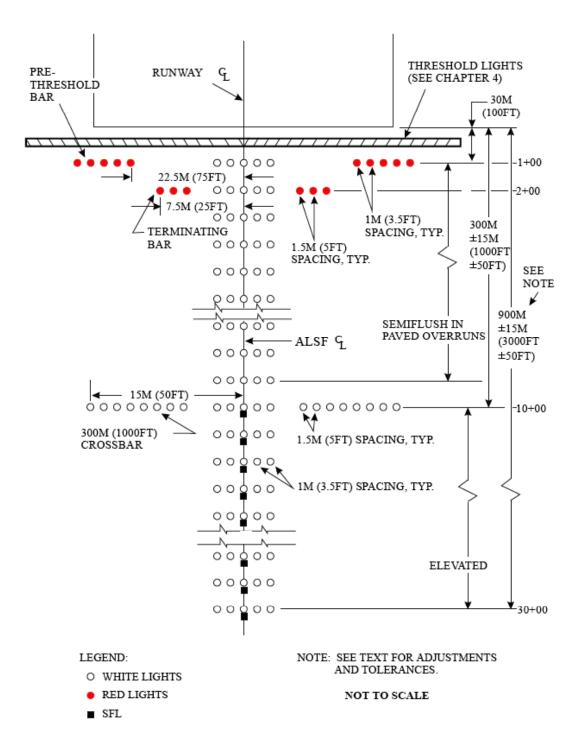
Typical Installation of an ALSF-1 (Source: Department of Defense, Unified Facilities Criteria: Visual Air Navigation Facilities Document UFC-3-535-01.)
